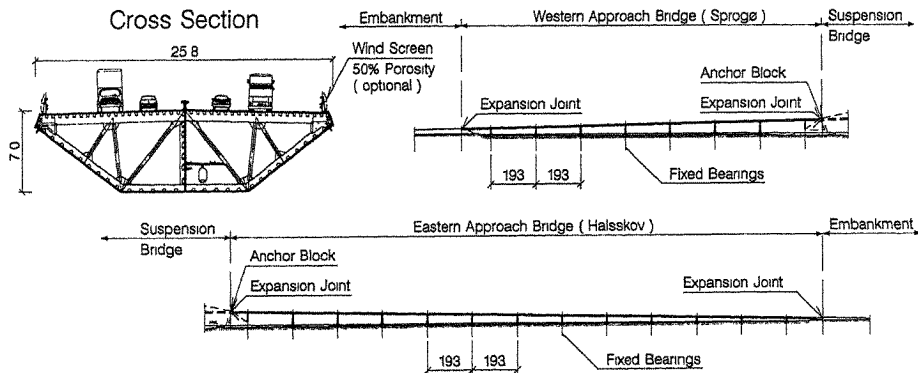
Elevation and typical cross section for the Great Belt East Bridge Approach Spans
